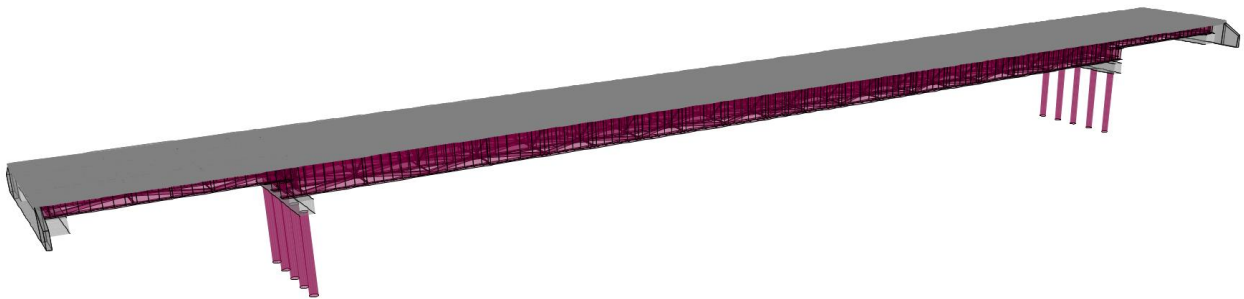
Perspective rendering of the Ksi Gingolx Bridge CSiBridge model showing the steel superstructure, precast concrete deck, piers, and jump spans at each abutment.
